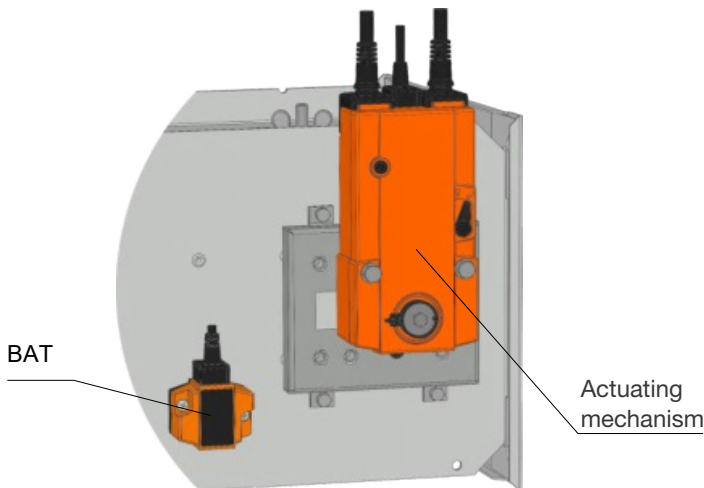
Actuating mechanism BELIMO BFL (BFN) 230-T
